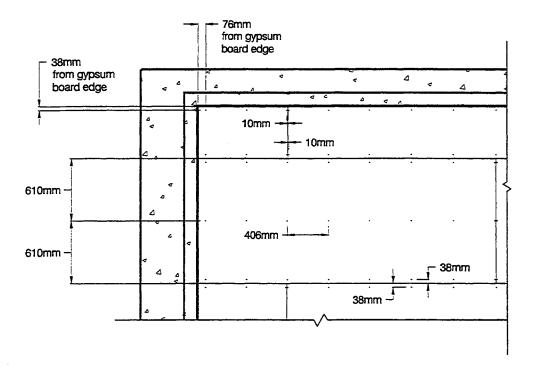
Screw patterns for base layer of gypsum board with resilient metal channels 406 mm o.c.
